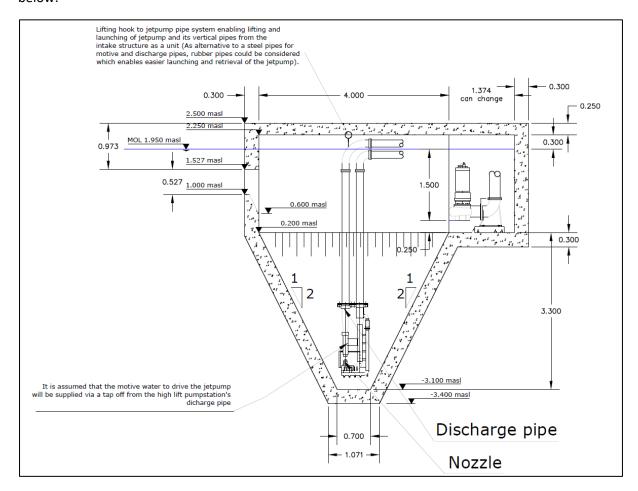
Example of section view indicating possible changes required on widths and elevations
